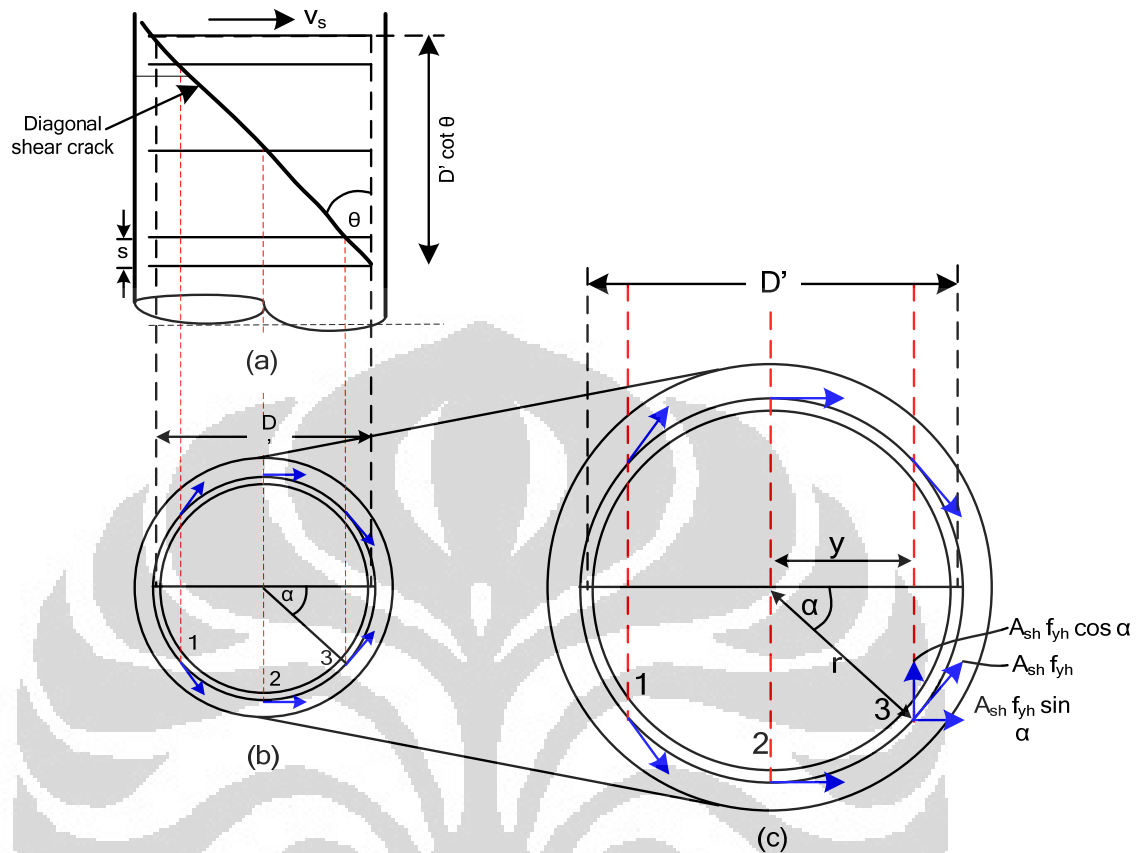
Shear carried by transverse reinforcement considering three intersection points of diagonal shear crack and transverse reinforcement.
